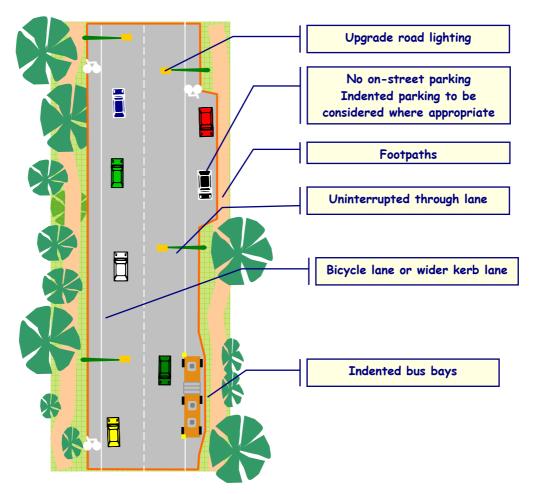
Typical Mid-block Cross-section for Sections 1 and 2
